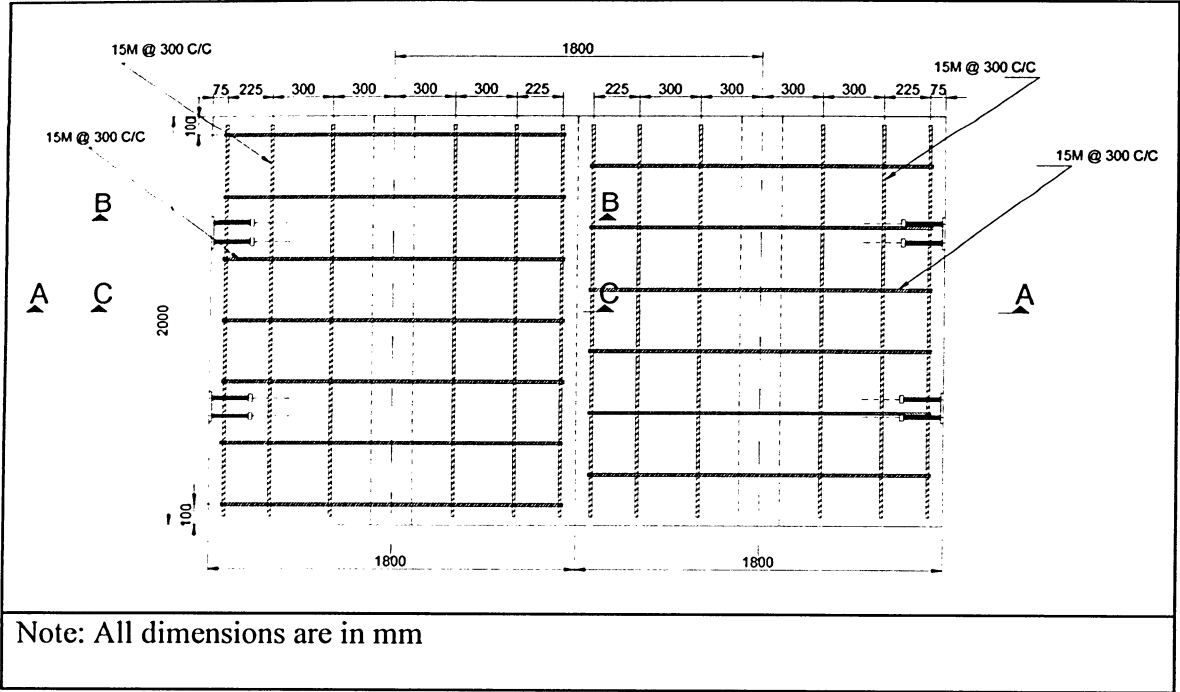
(c) Plan of Bottom Rebar Arrangement for Model M1
